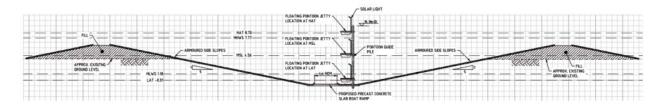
Typical Section – Alternative Location – Revetment Side Slope Option
